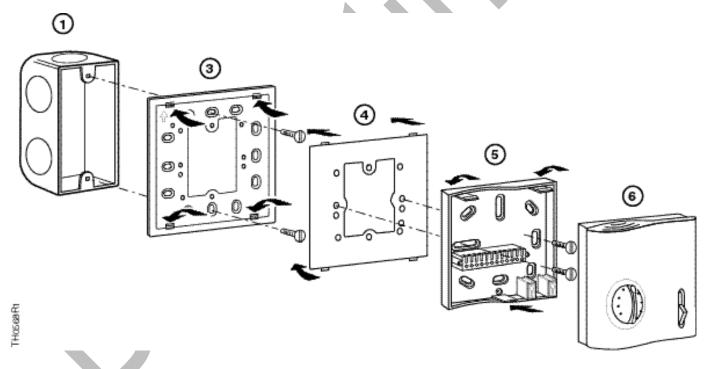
2-inch × 4-inch Electrical Wall Box Installation.
